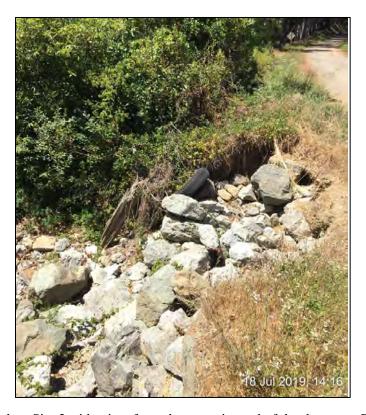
Looking North at Site 1, this shows the side view of the embankment shoulder where most of the washout occurred. Photograph taken July 18, 2019.
